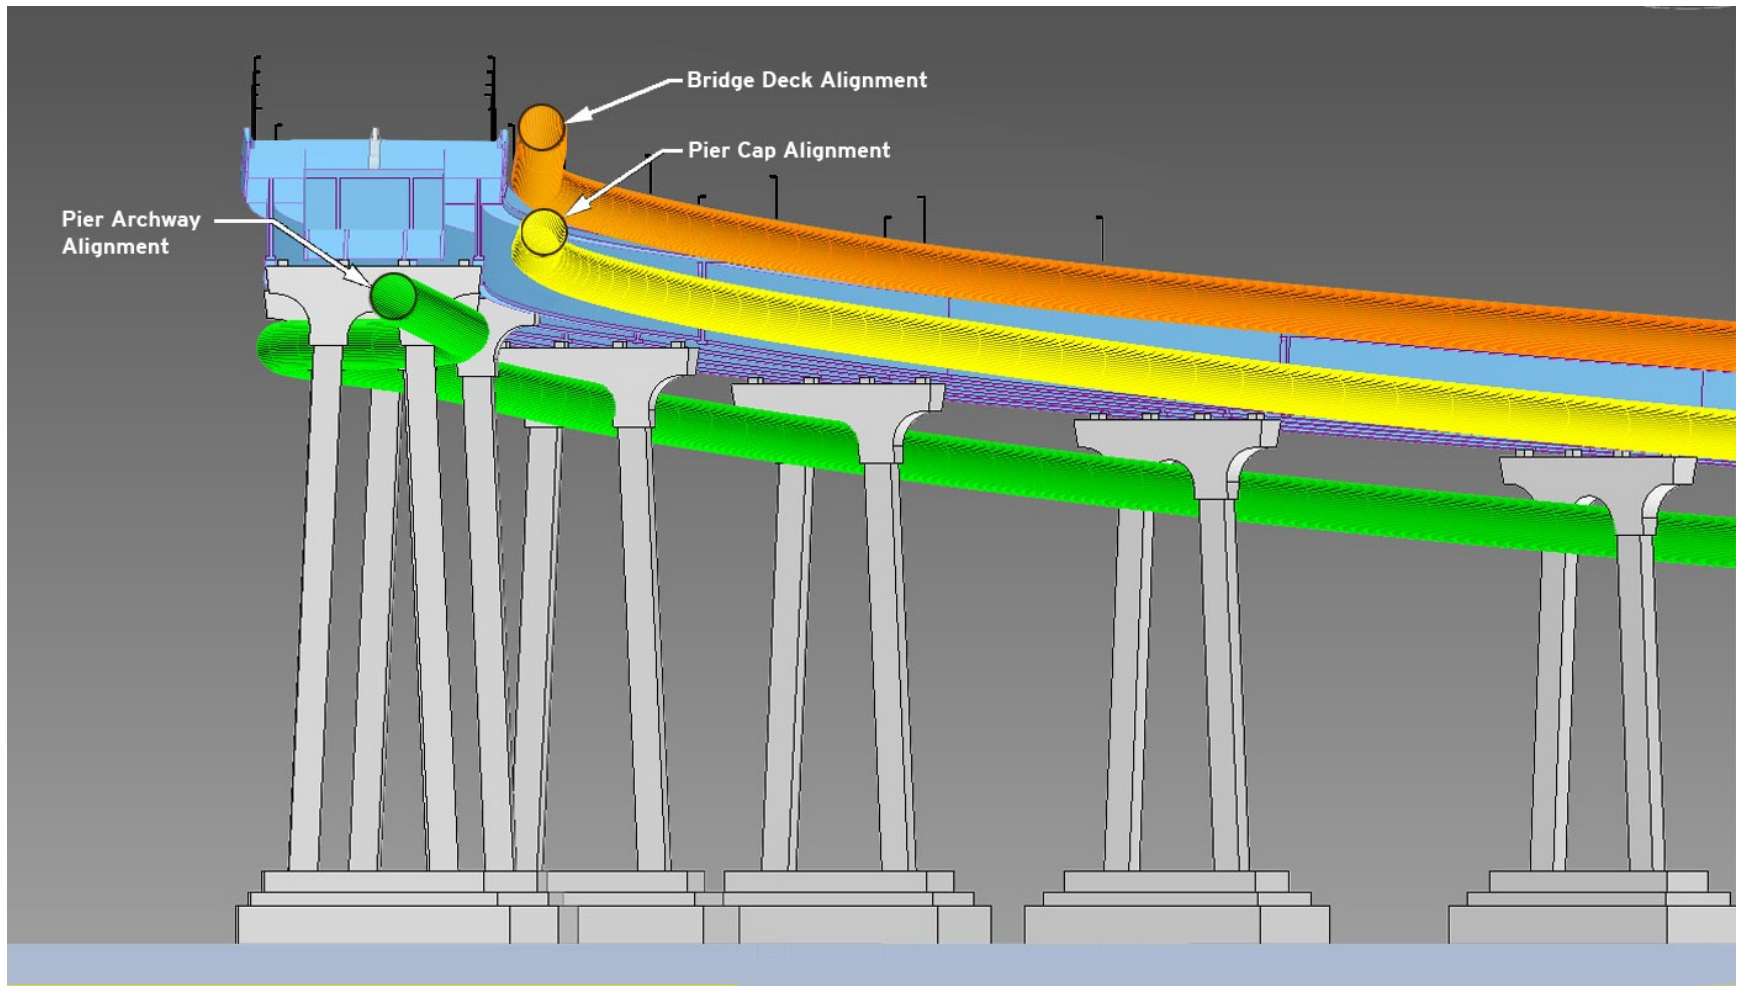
Alignment Options (Pier Archway, Pier Cap and Bridge Deck) Relative to Existing Bridge Structure
